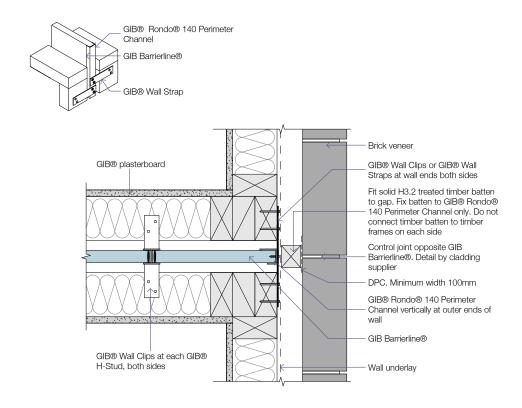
DETAIL AT RETURN IN EXTERNAL BRICK VENEER WALL (PLAN VIEW)
